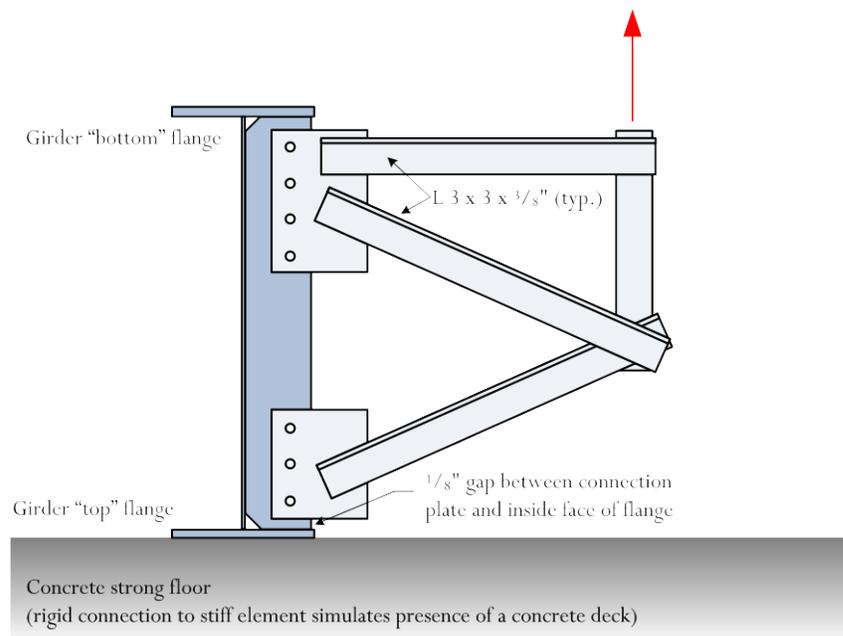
Cross-section schematic of the test set-up for the 9' girder specimens
